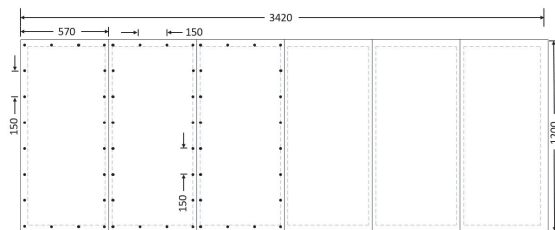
Technical drawing of the wall configuration. Dimensions in mm.
